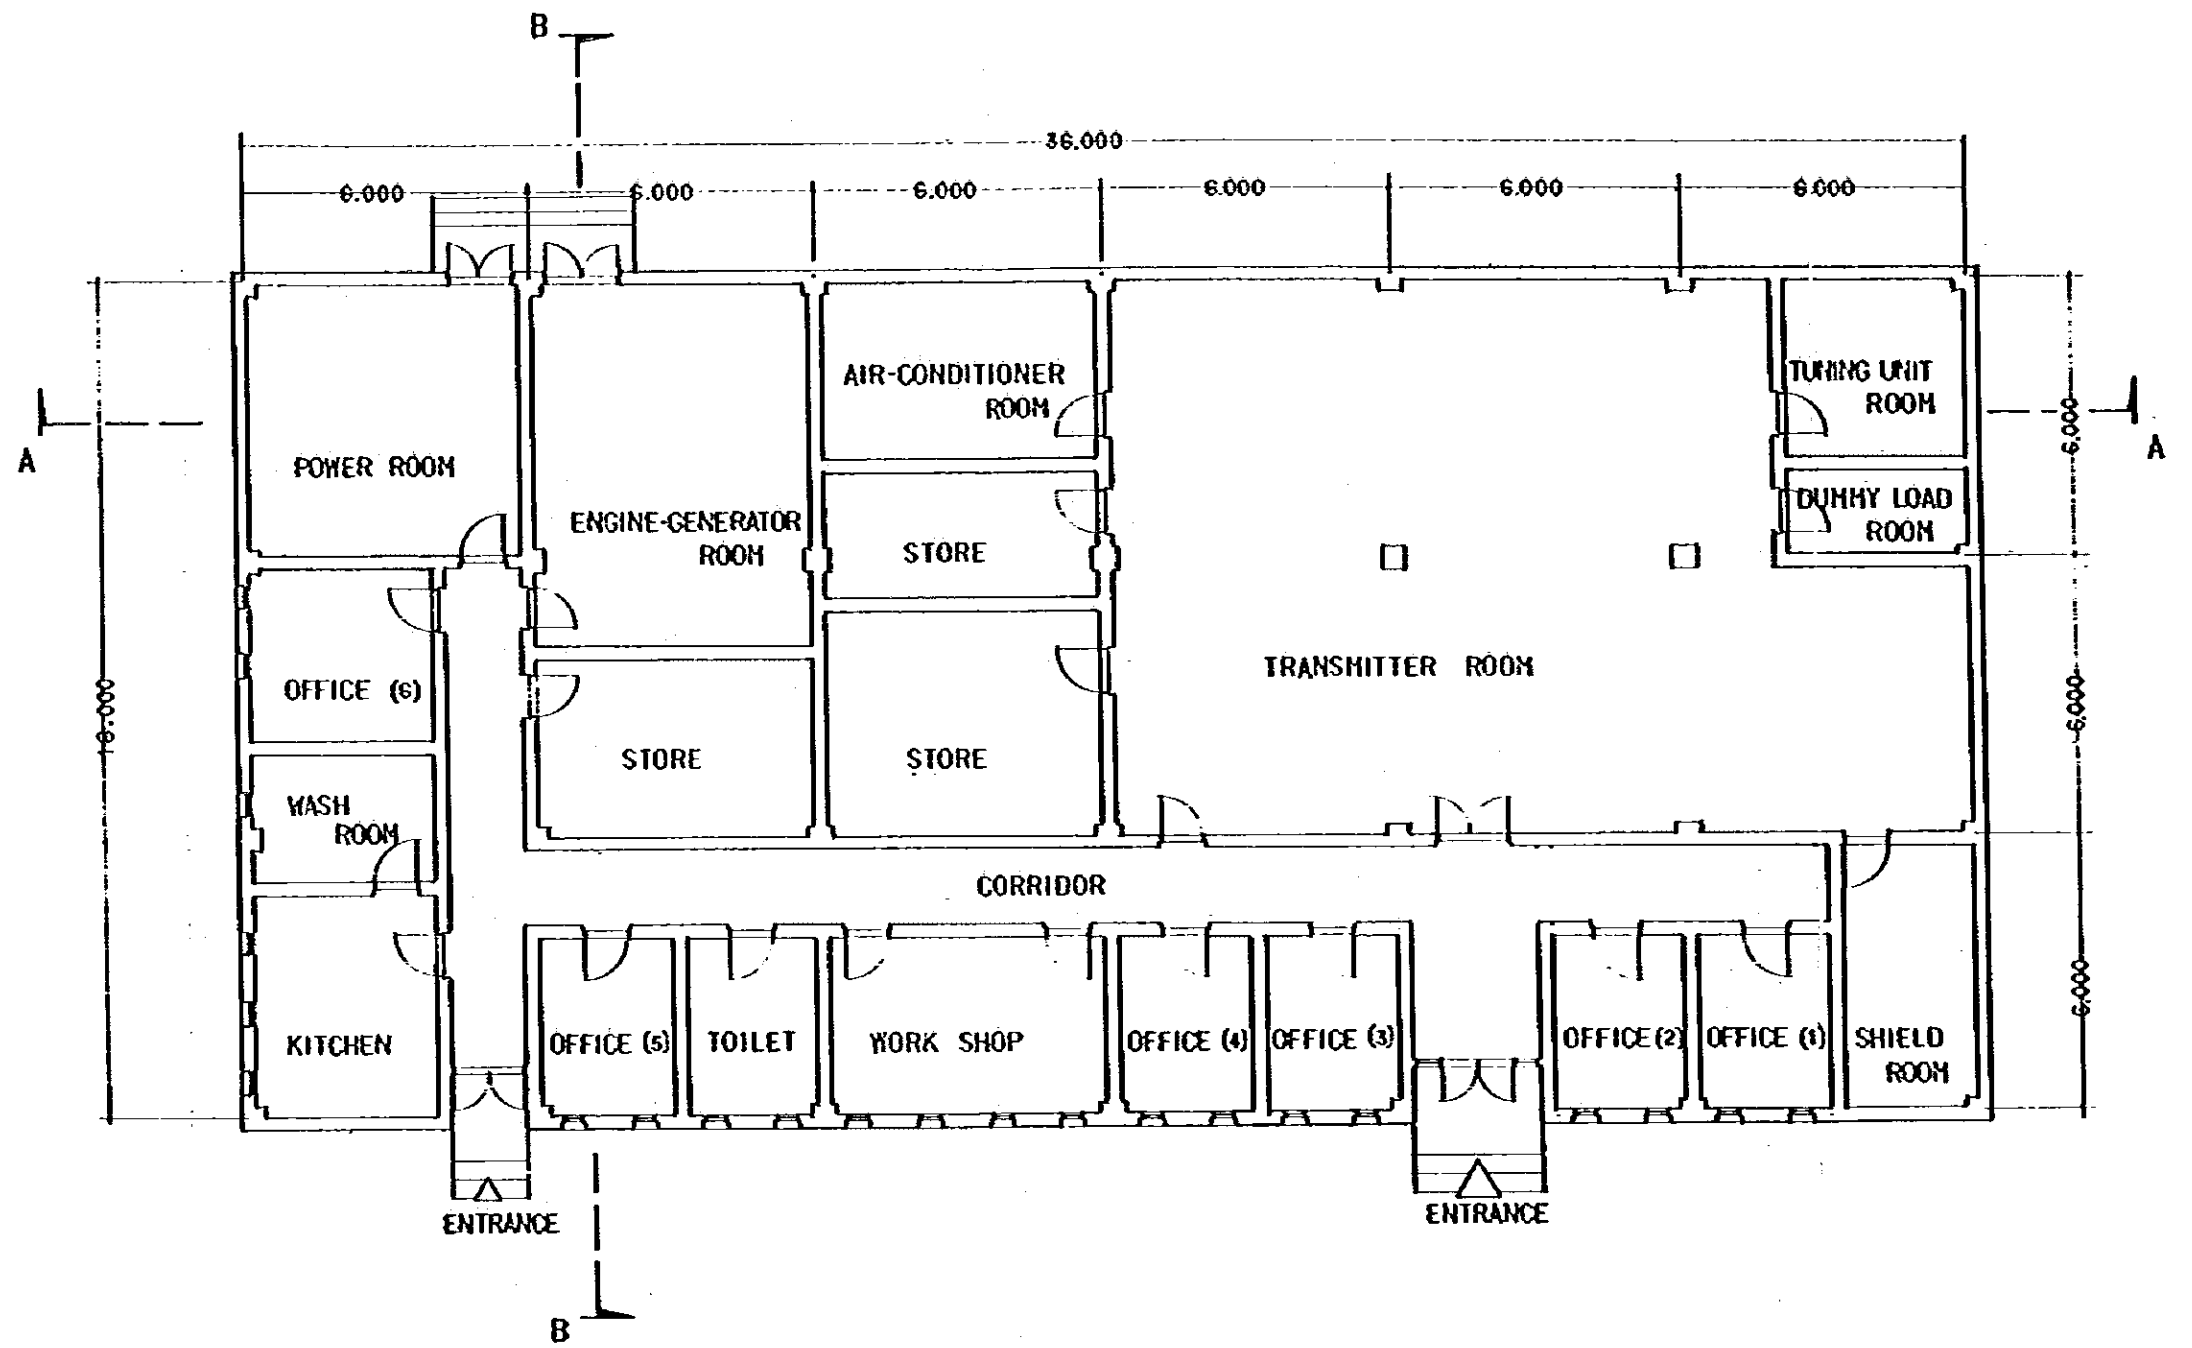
FLOOR PLAN — KATHMANDU TRANSMITTING STATION
